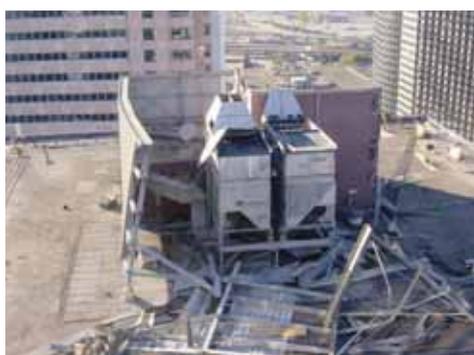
Rooftop penthouse on Amoco Building was nearly destroyed
